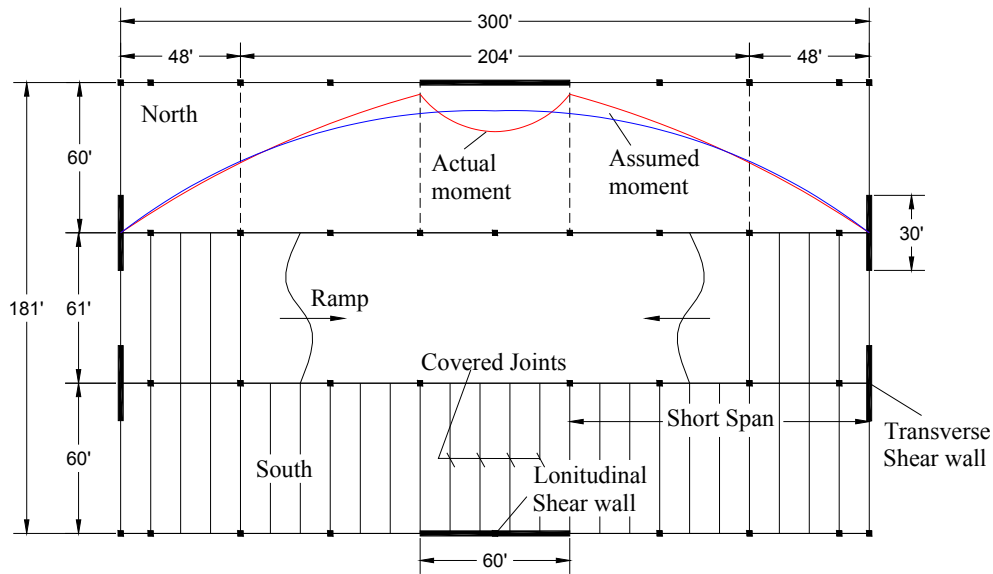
Plan for a 4-story parking garage with perimeter shear walls.
